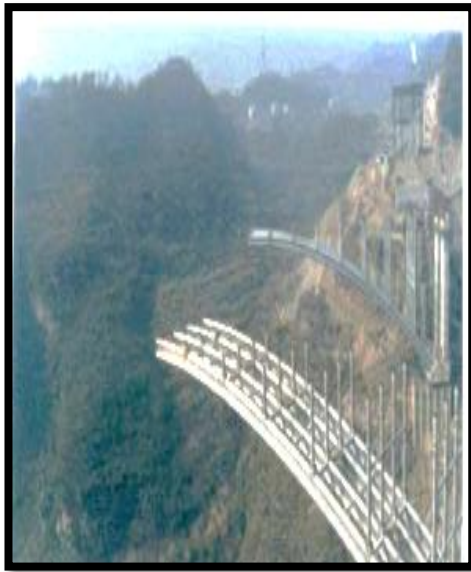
A concrete filled tubular arch bridge under construction (Photo courtesyOf Tsinghua University, China) Prof. LH Han, (Şamhal, 2005)
